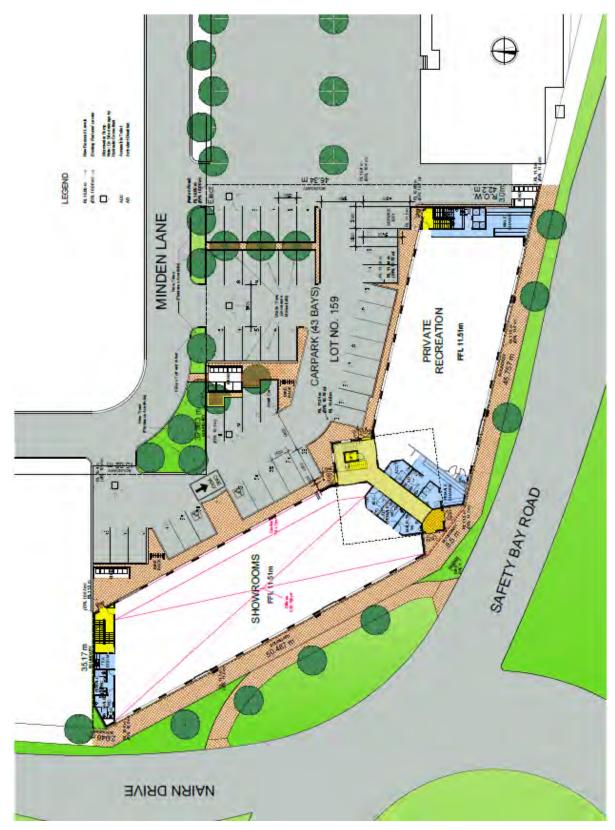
Revised (Current) Site and Ground Floor Plan (8.6.2015)
